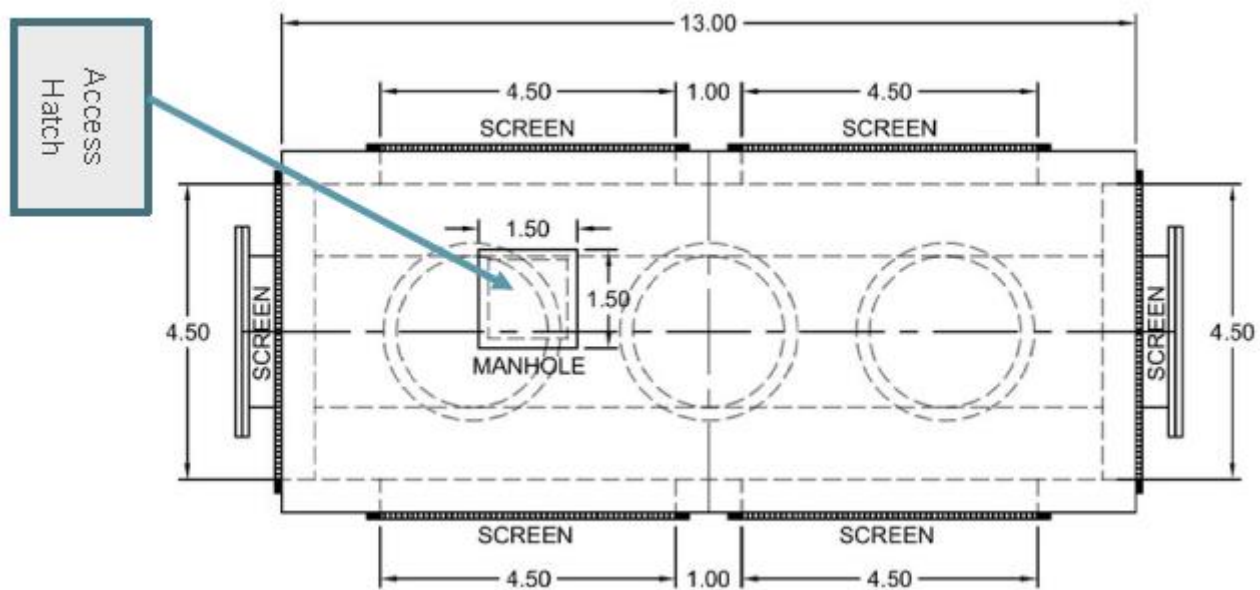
Intake Tower – Top View (Source: Dar/HR Wallingford, 2021)
